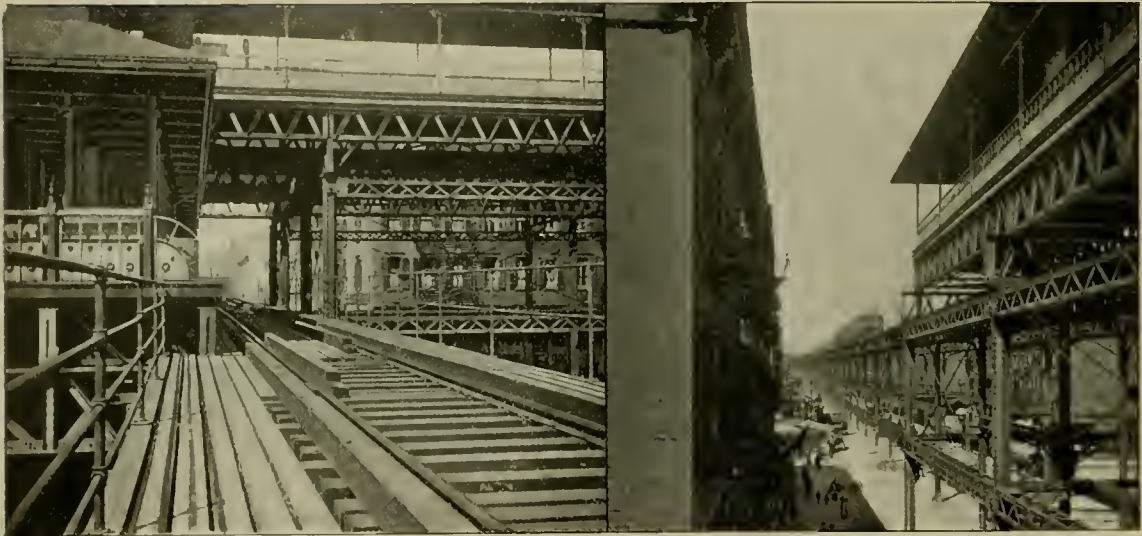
THIRTY-FOURTH STREET SHUTTLE RUNNING UNDER SECOND AVENUE LINE. LOOKING NORTH ON SECOND AVENUE LINE FROM THIRTY-FOURTH STREET.
